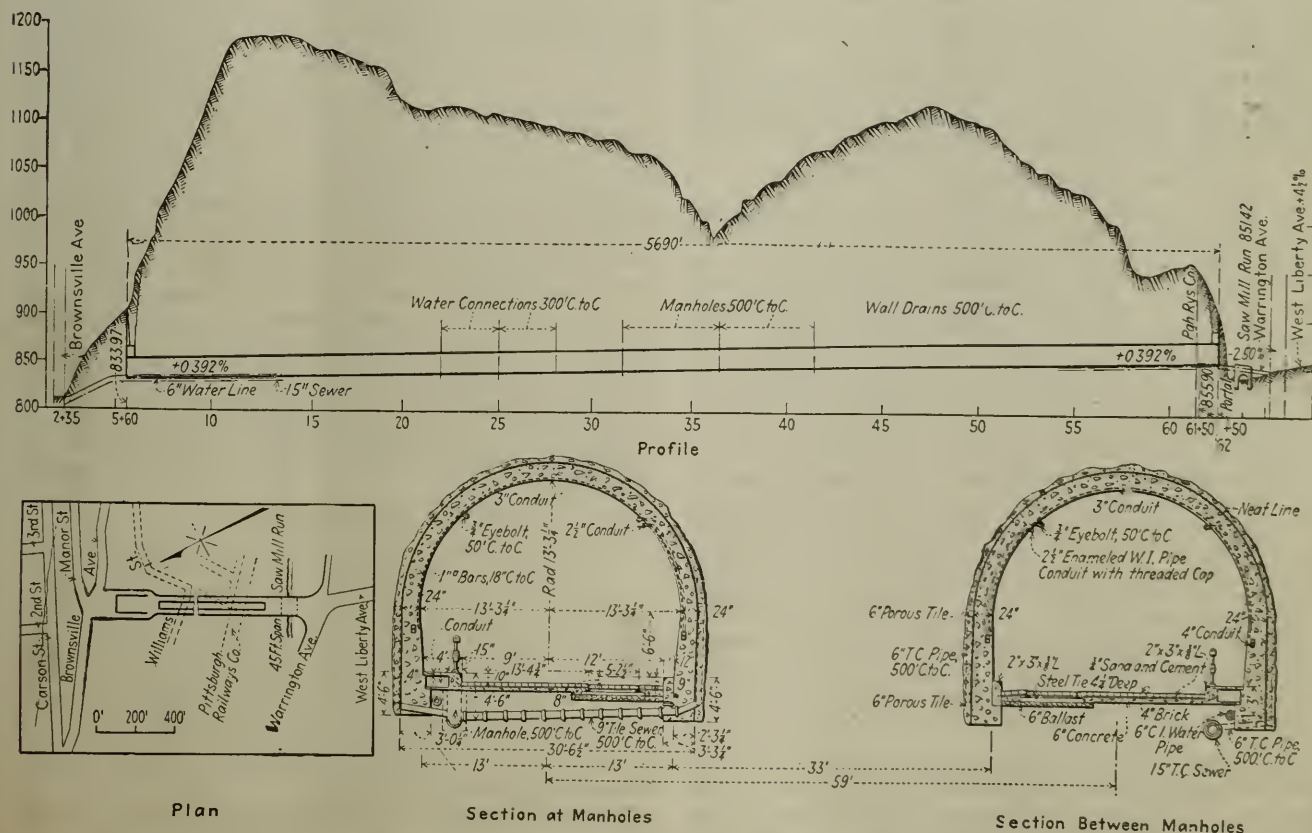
PROFILE AND CROSS-SECTION OF DOUBLE-TUBE HIGHWAY TUNNEL THROUGH SOUTH HILLS, PITTSBURGH; LENGTH 5,715 FEET
